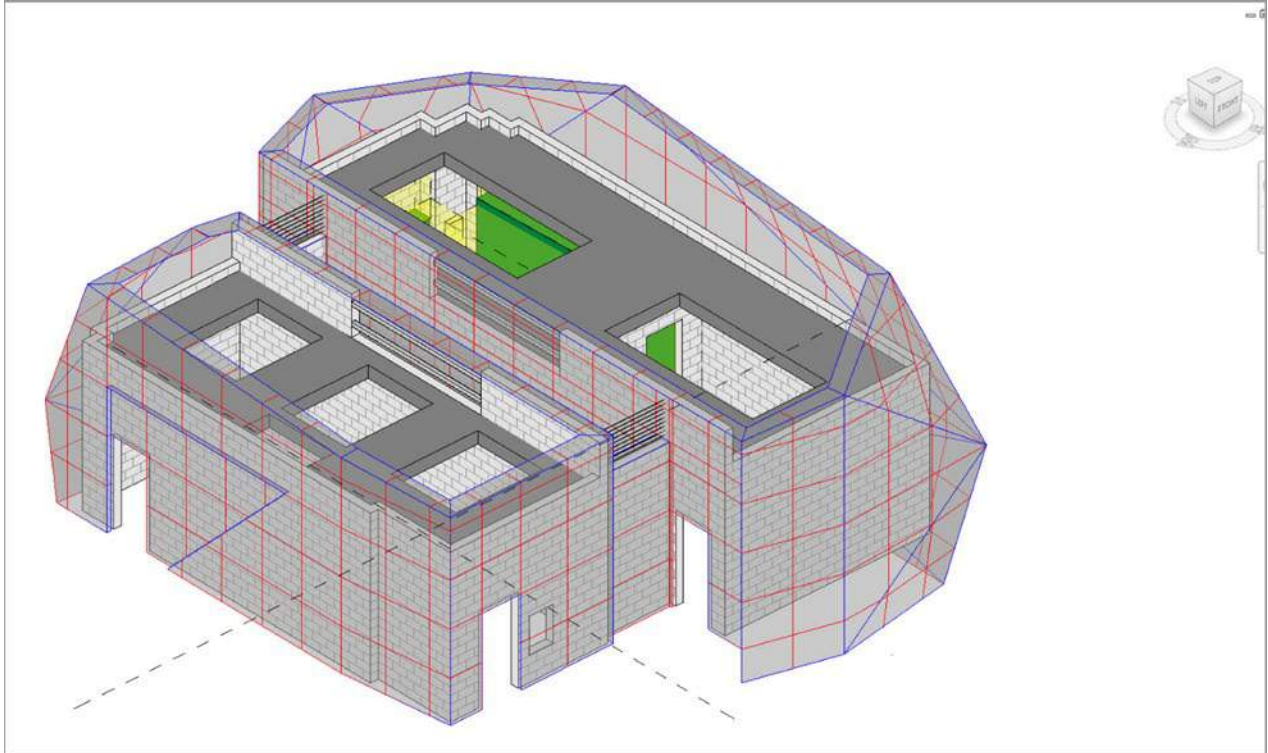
Original CMU Building with Ornamental Skin (from Heller Manus Architects)
